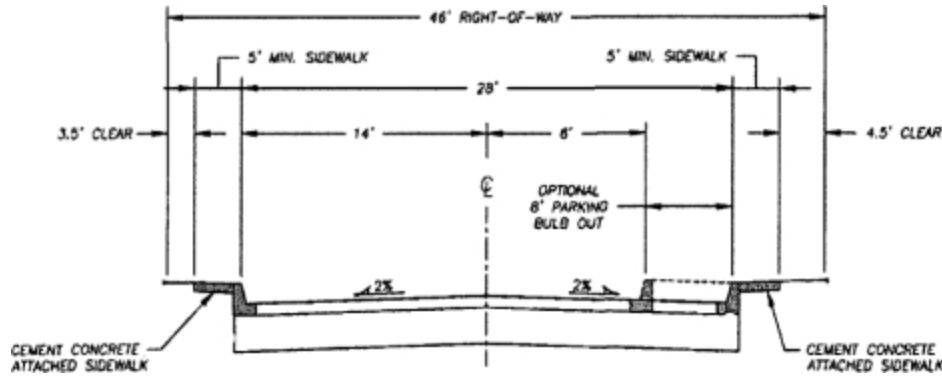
Narrow Lot Street Cross-Section
